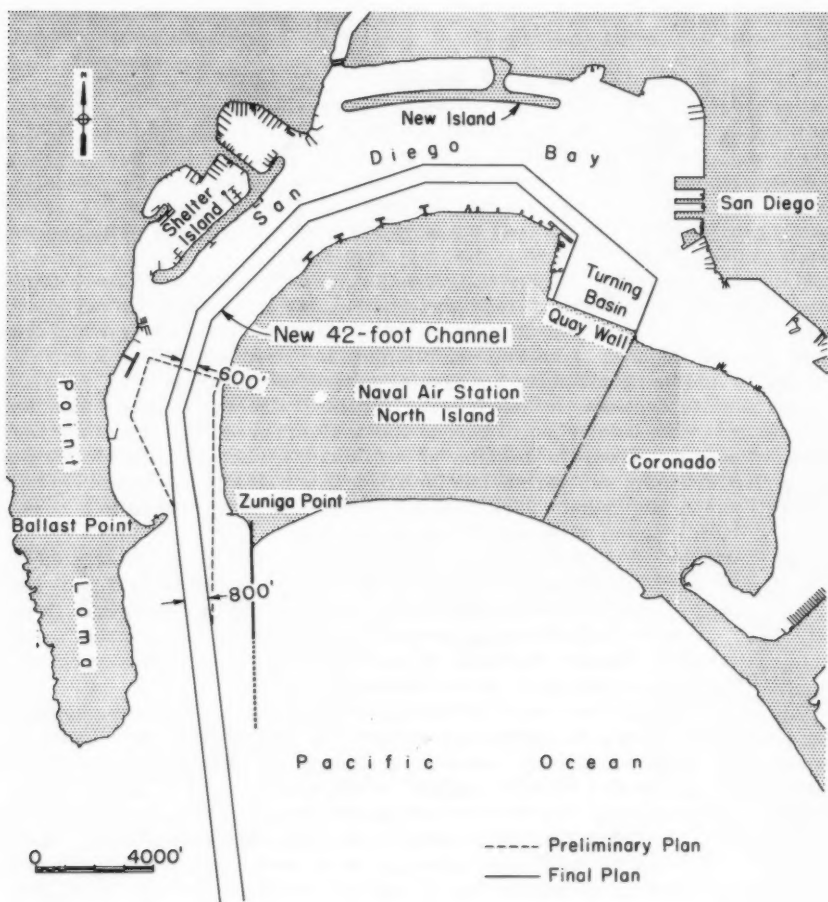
GENERAL PROJECT PLAN SHOWING PRELIMINARY AND FINAL DREDGING AREAS
